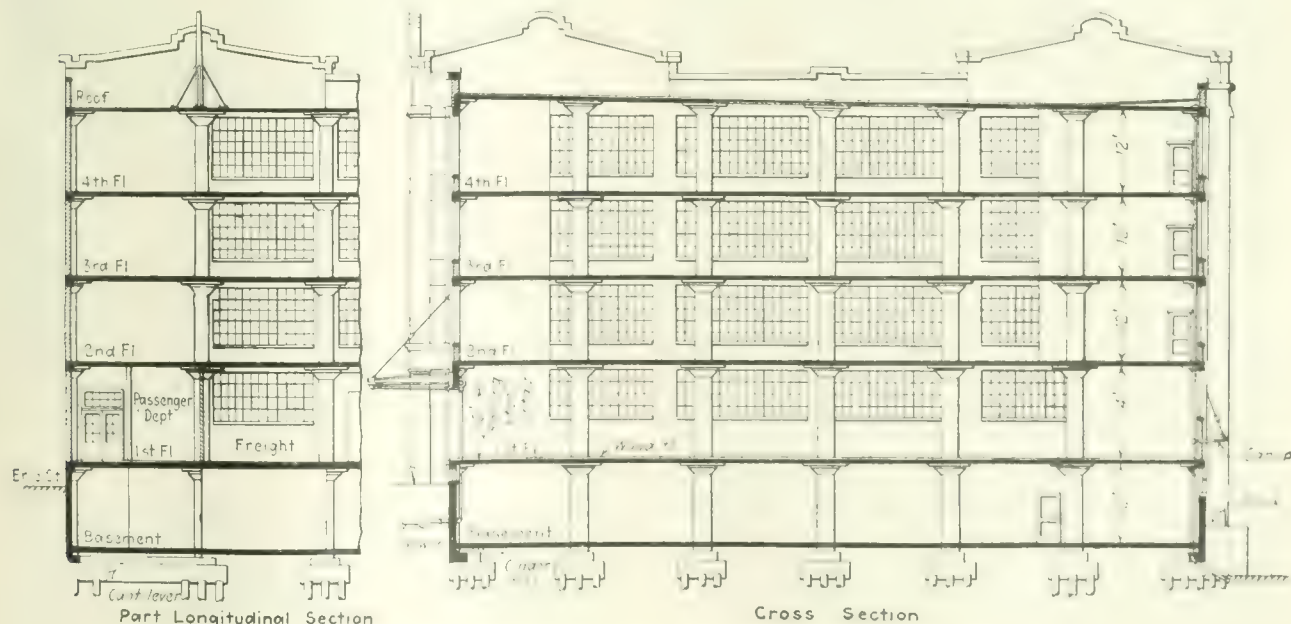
CROSS SECTION OF DOCK AND WAREHOUSE BUILDING
